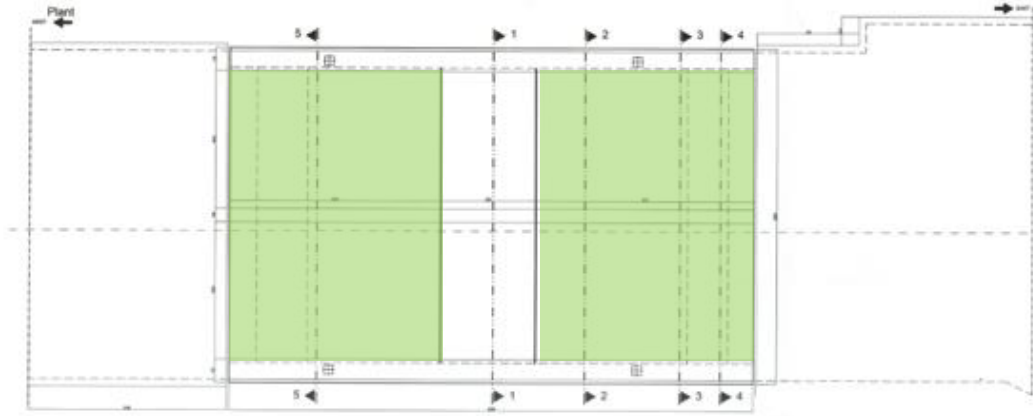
The location of cantilever arch slabs in plan of bridge
